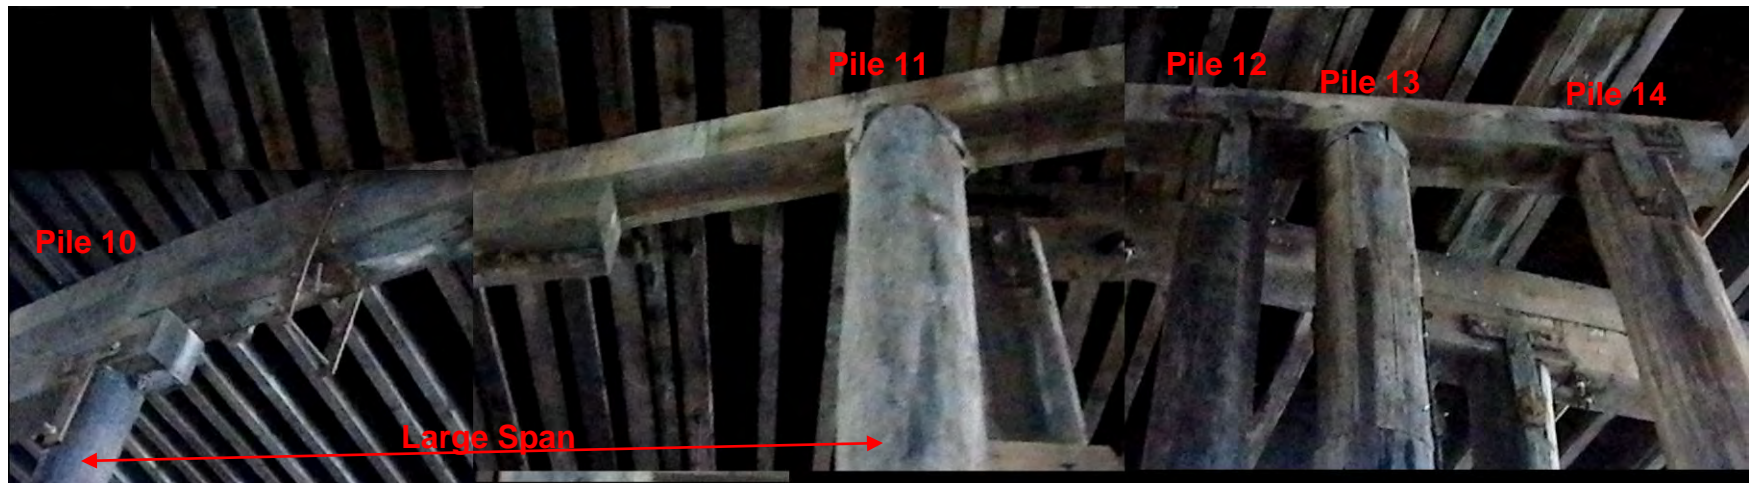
Composite photo of Bent 137A, ~14 ft. span and damaged piles 12-14 (below water)
